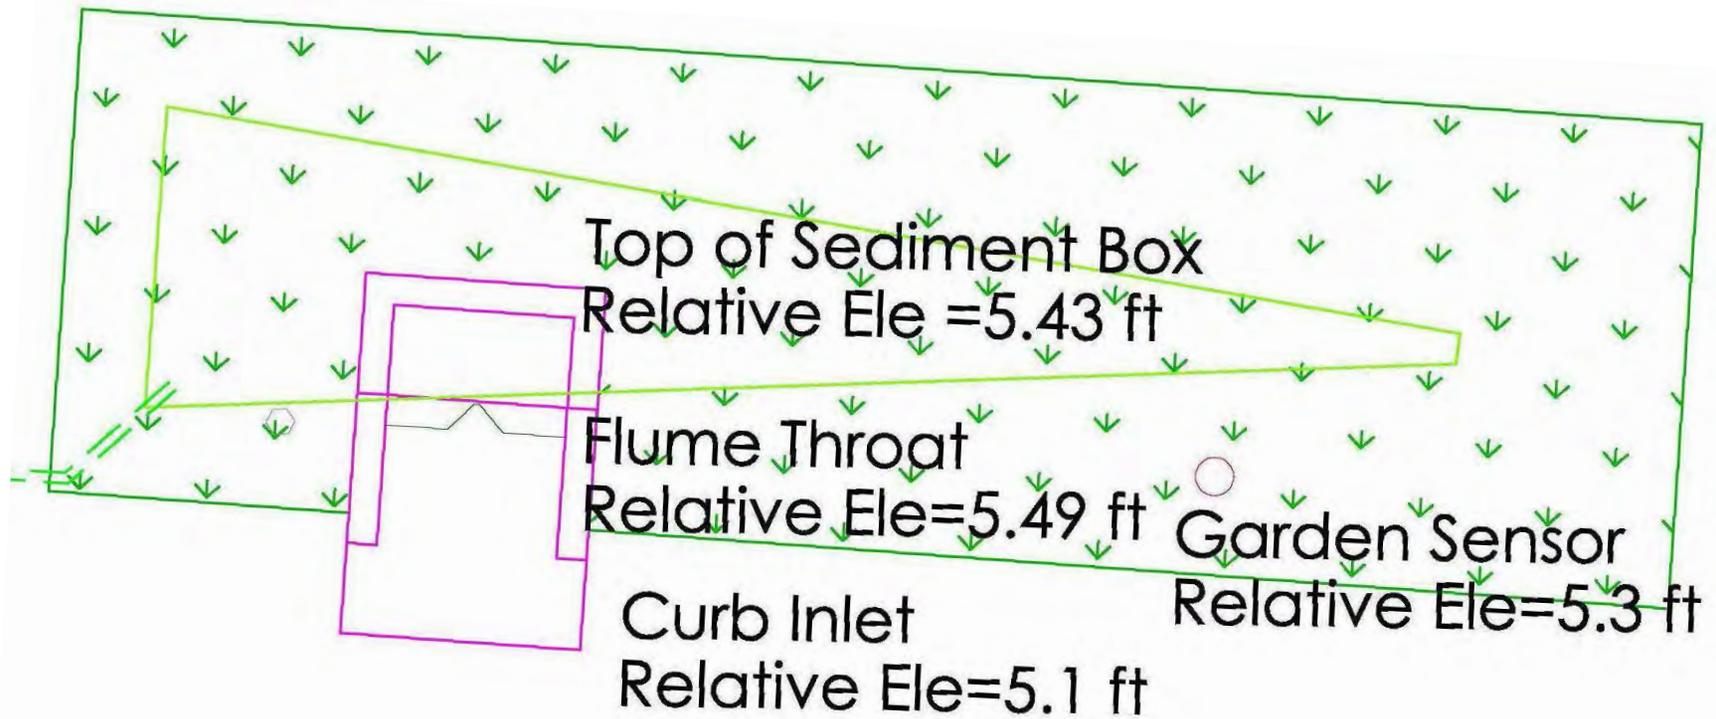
As-built Schematic For Monitoring Installation at Individual GI Solution #4 at 1612 East 76th Street (Rain Garden Extension)
